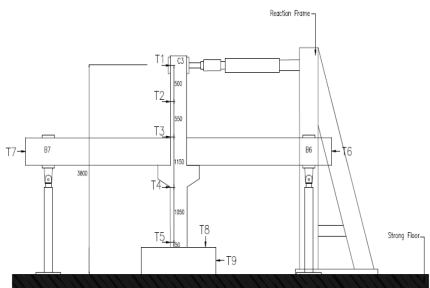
Schematic CAD drawing of LVDT location on specimen.
